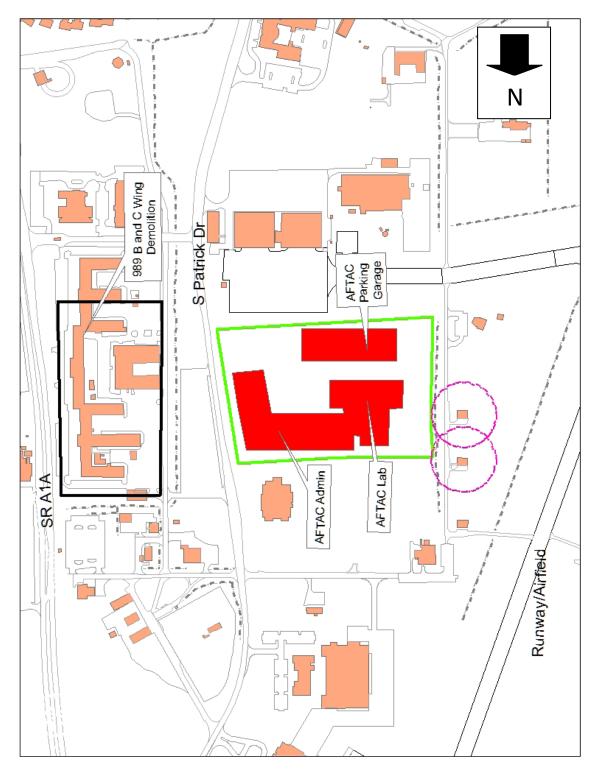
REVISED AFTAC FACILITY SITE PLAN
